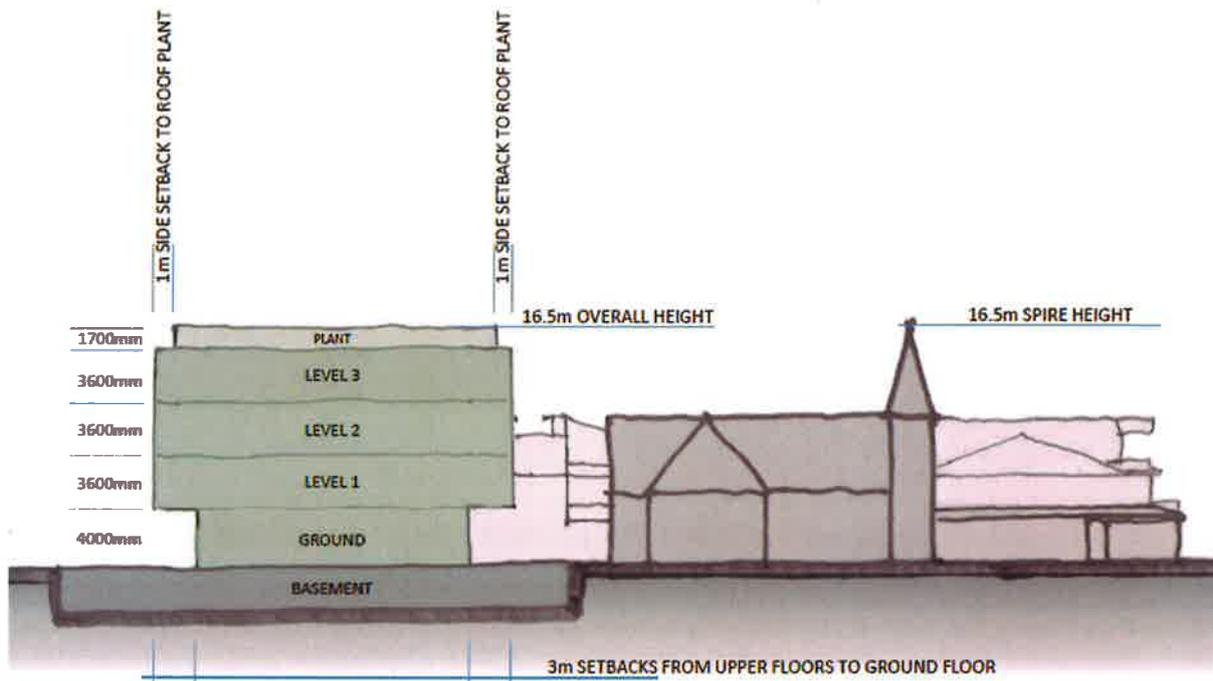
Proposed envelope and setback viewed from Lord Street (Source: Planning Proposal & BuiltConsult Pty Ltd)
